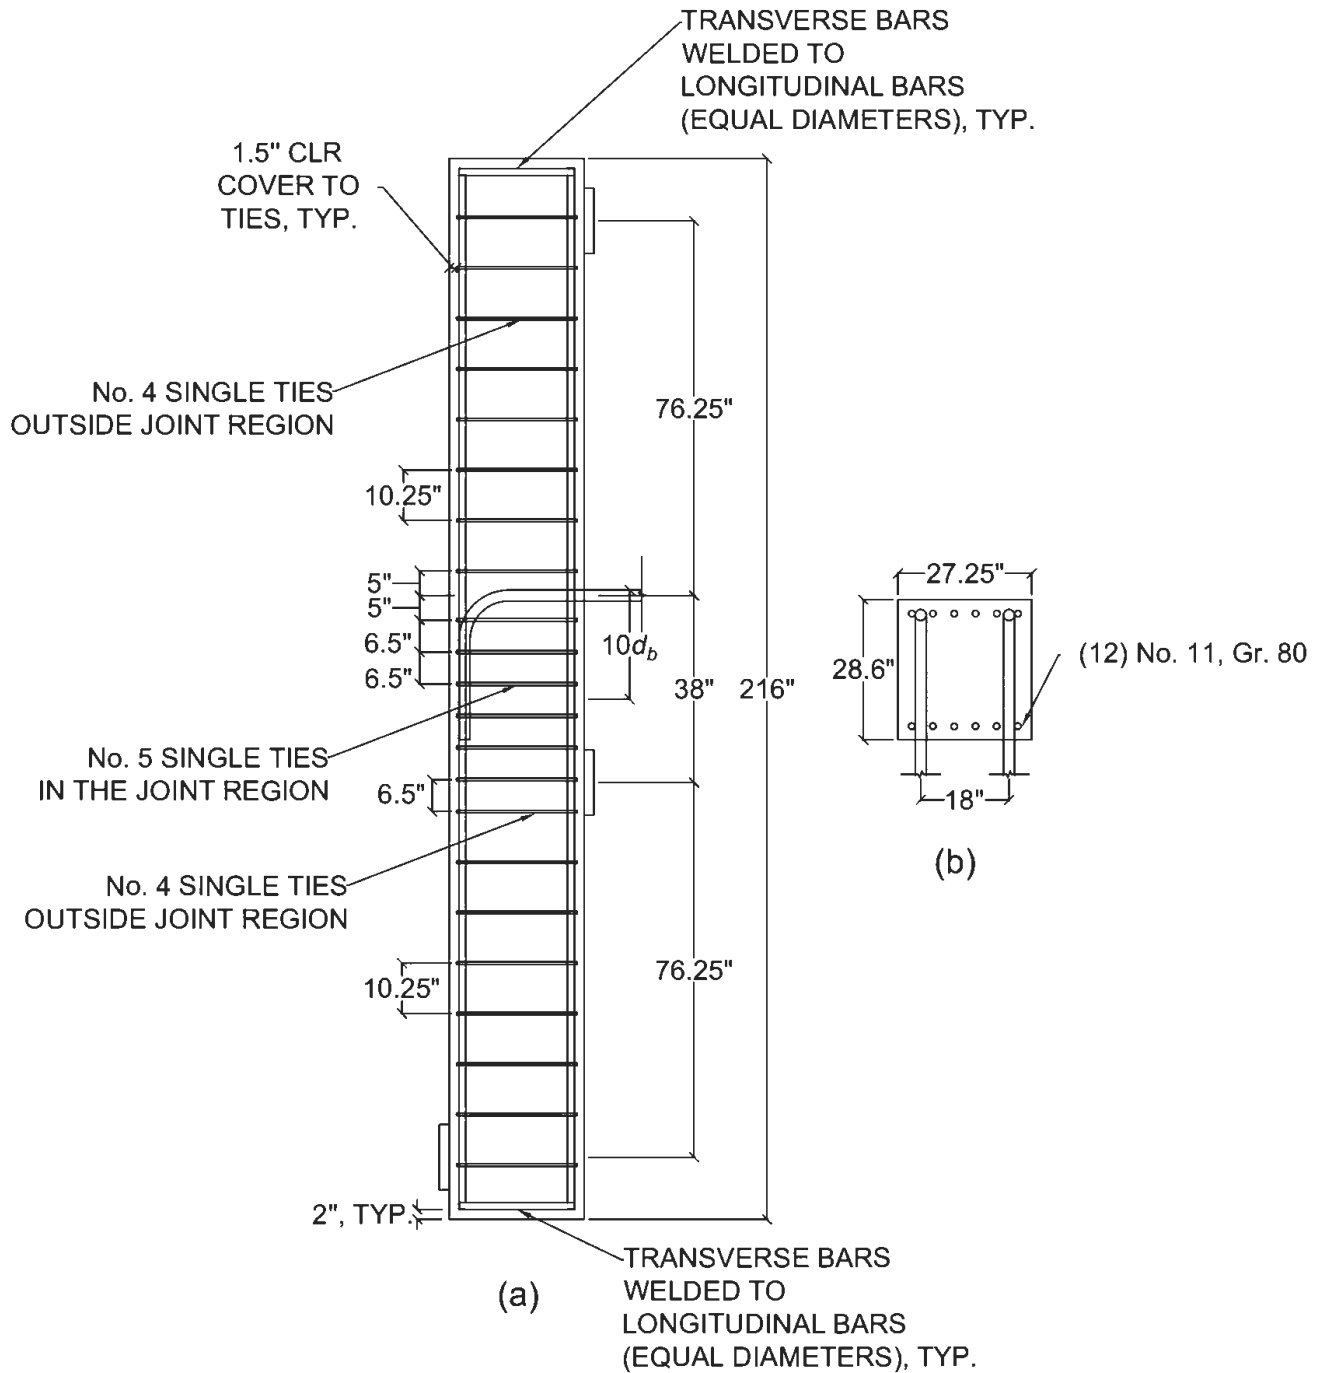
Details of reinforcement layout for No. 18 hooked bar specimen H18-1: (a) elevation, (b) cross-section
